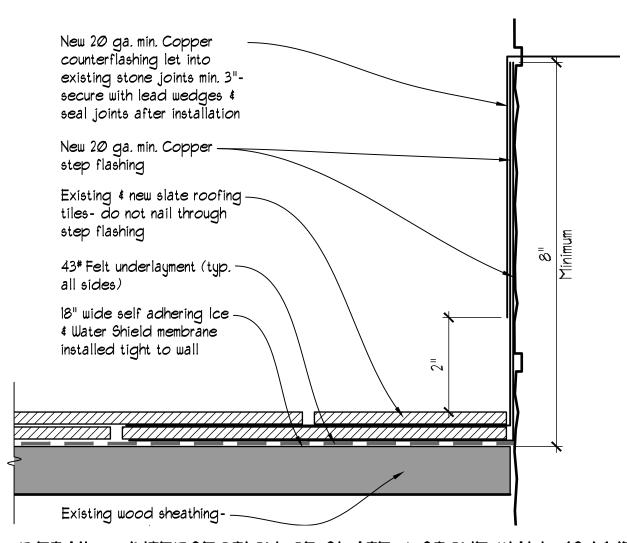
DETAIL @ INTERSECTION OF MB & STONE WALL (RIM5)
